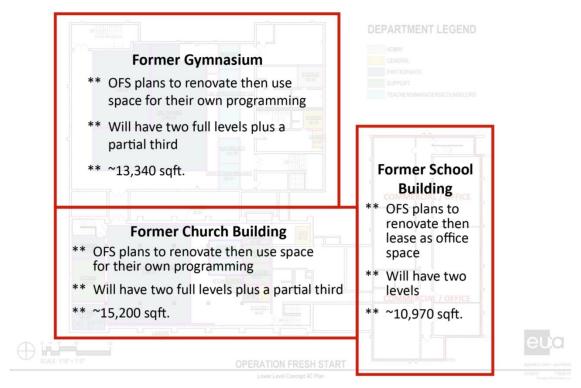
Overview of the Remodeling Plans for the Various Former Church Buildings (Graphic by C. Wells)
